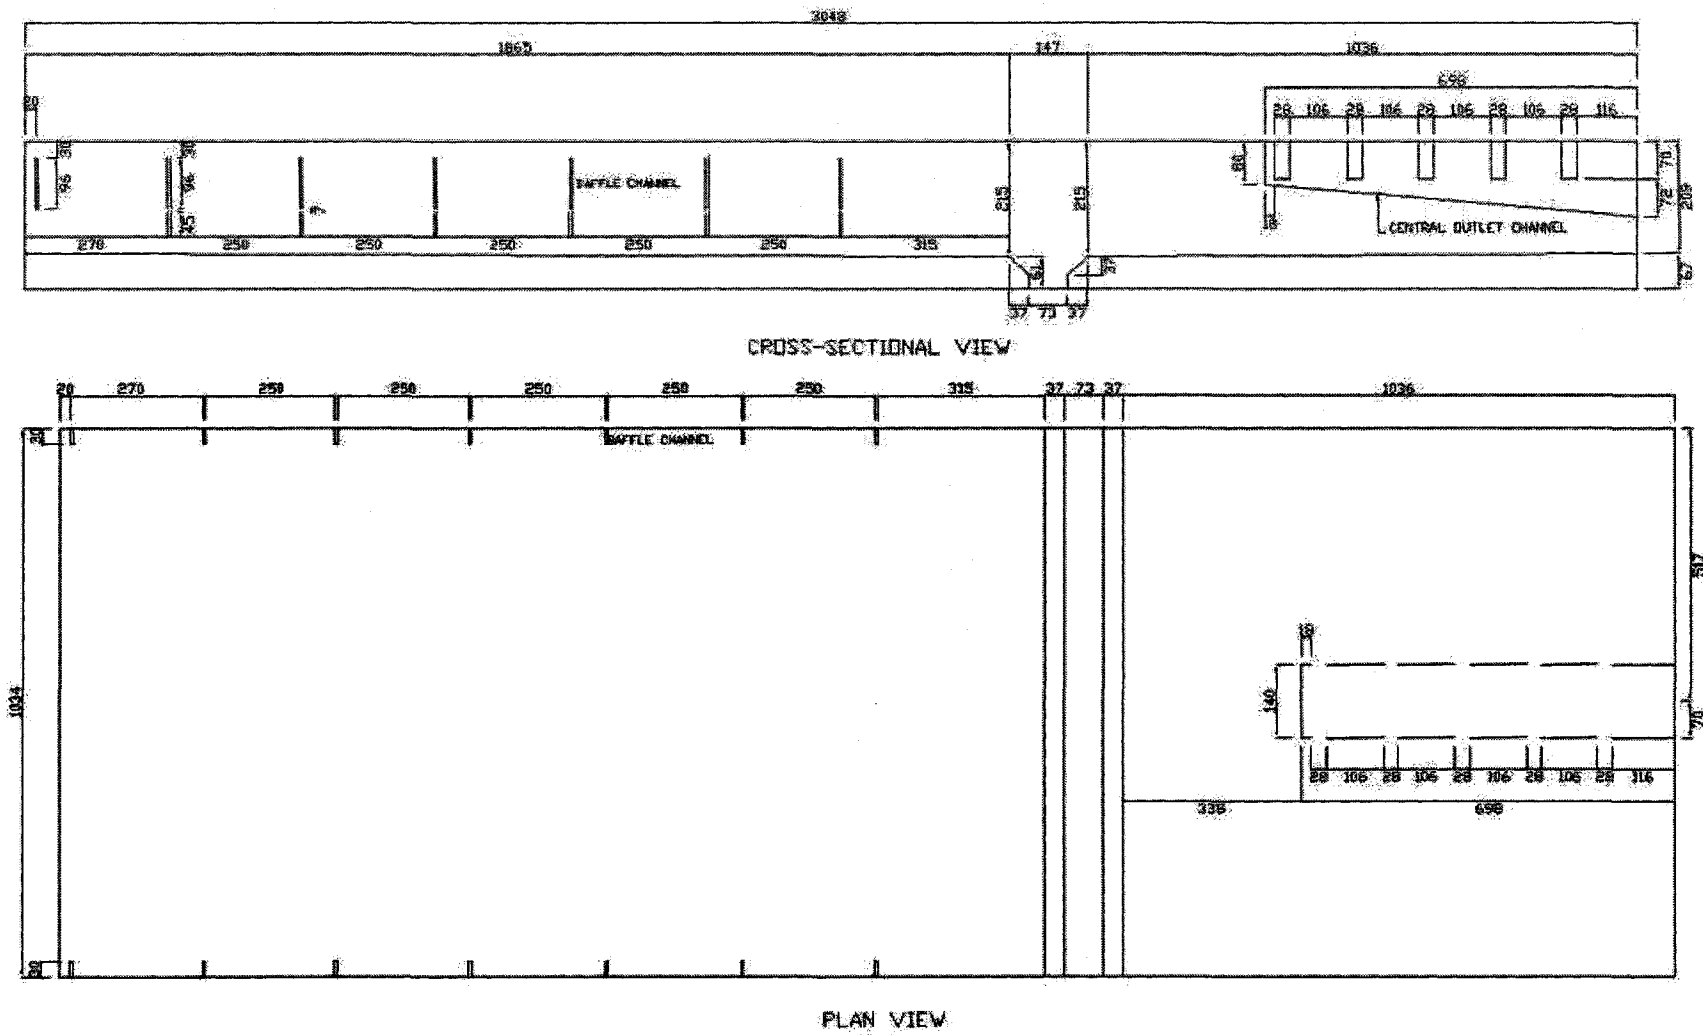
Cross-Sectional and Plan View of Pilot-Scale Secondary Clarifier
